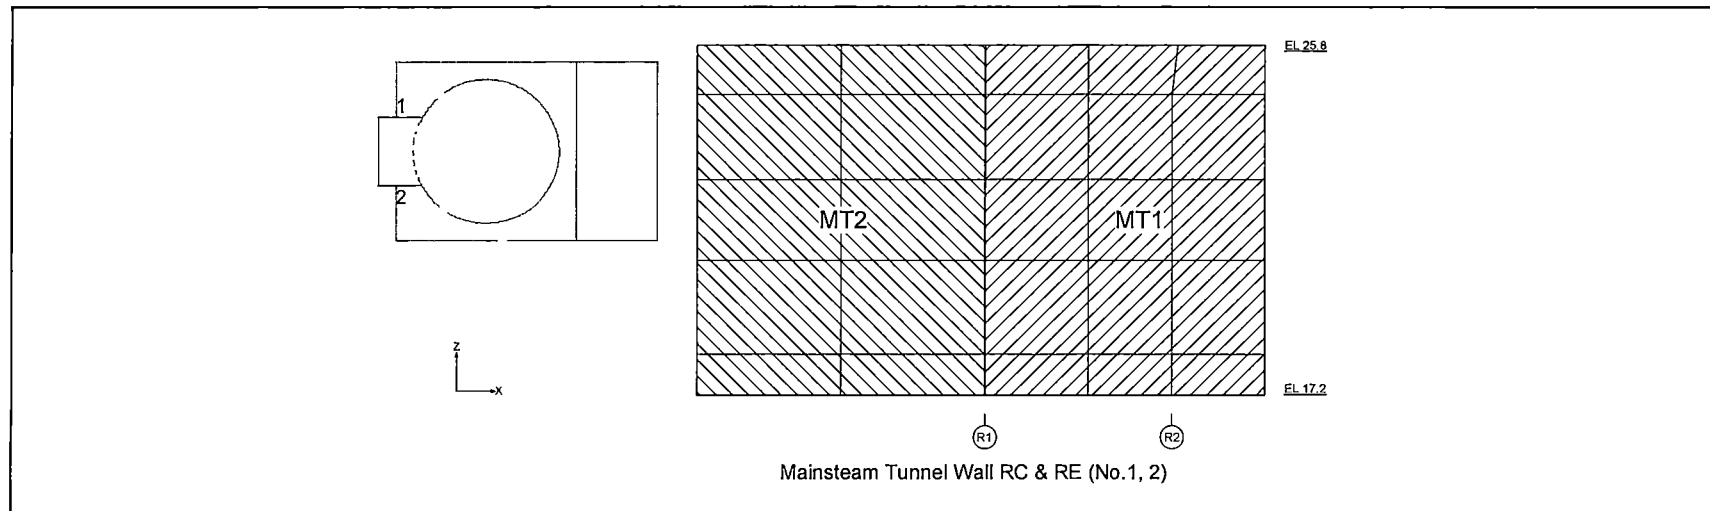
Application of Thermal Load on the MS Tunnel Wall
